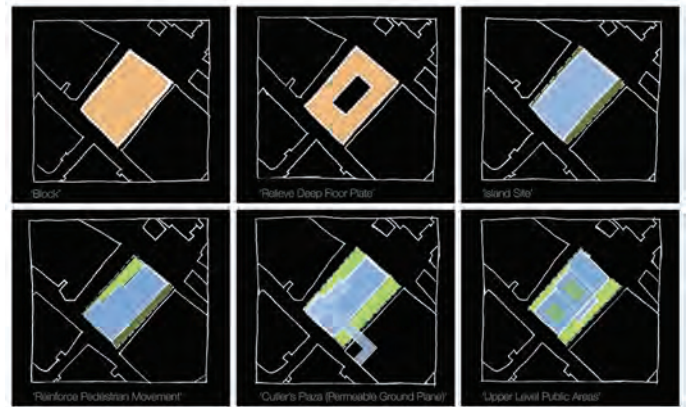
Houndsditch Properties (Source: Stephan Reinke Architects)
